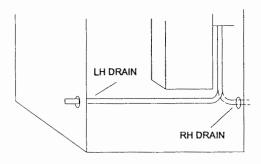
CONDENSATE DRAIN CONNECTION
